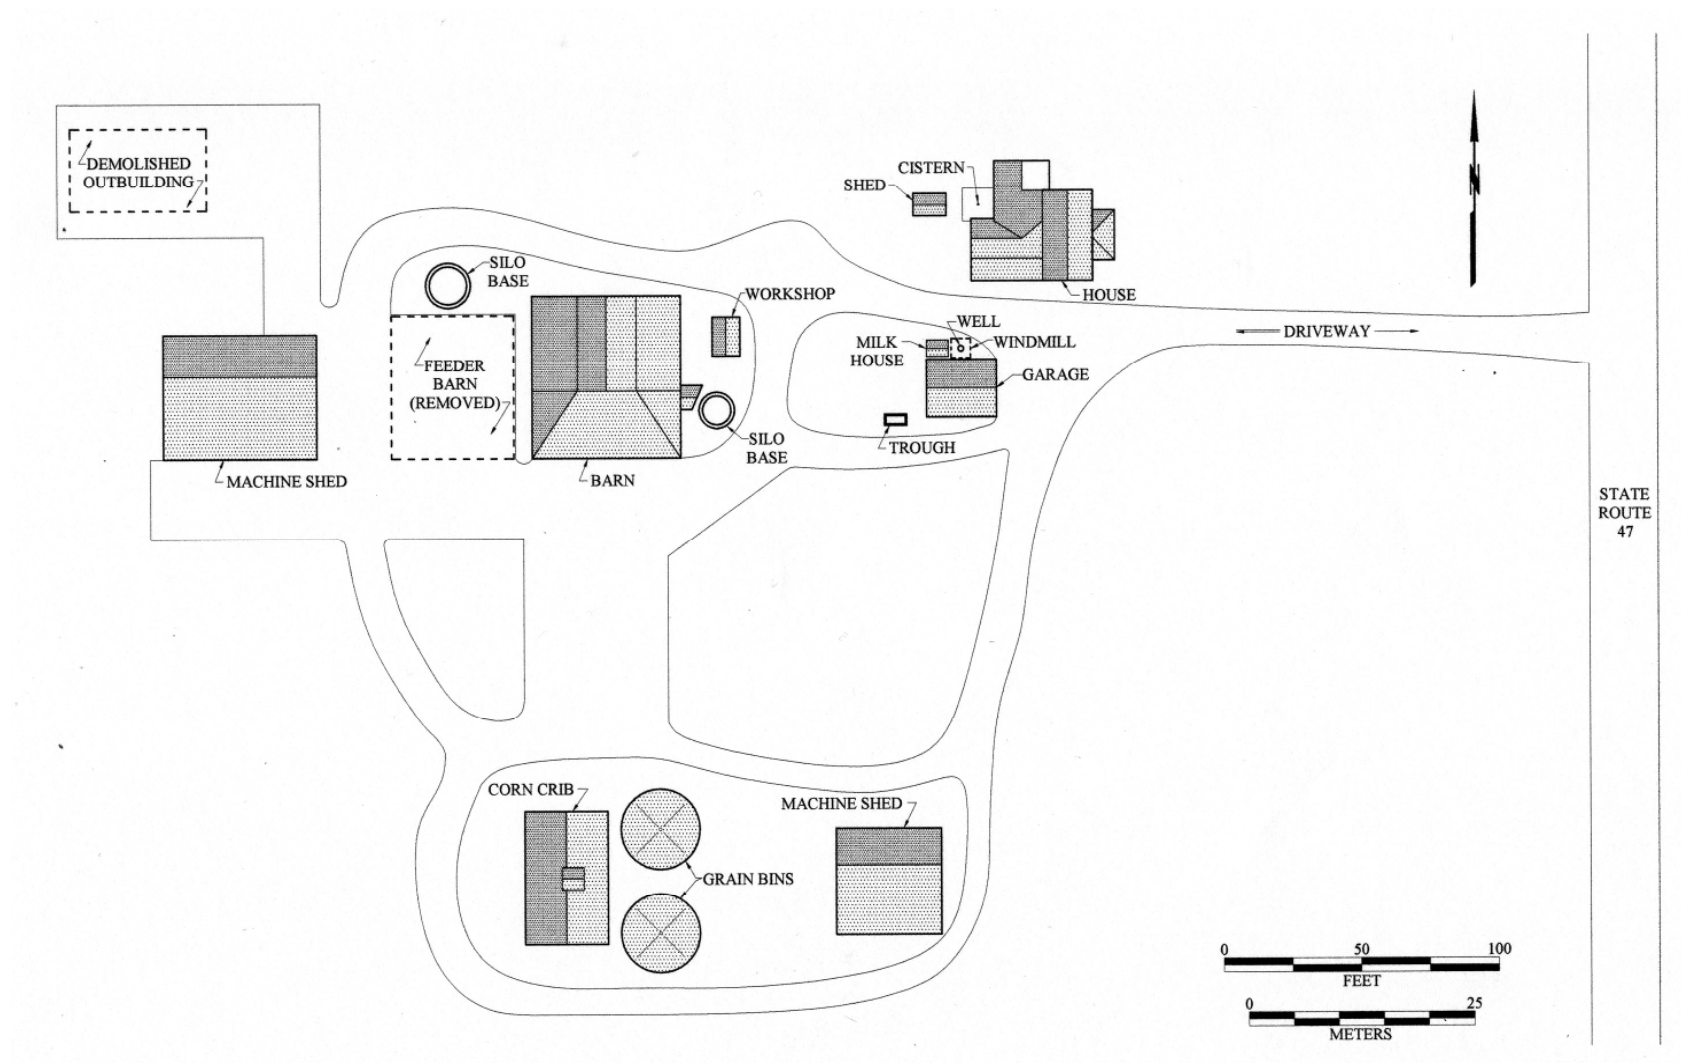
Plan of the Sibley Tenant Farmstead Site (11FO64) showing conditions in 2011.
